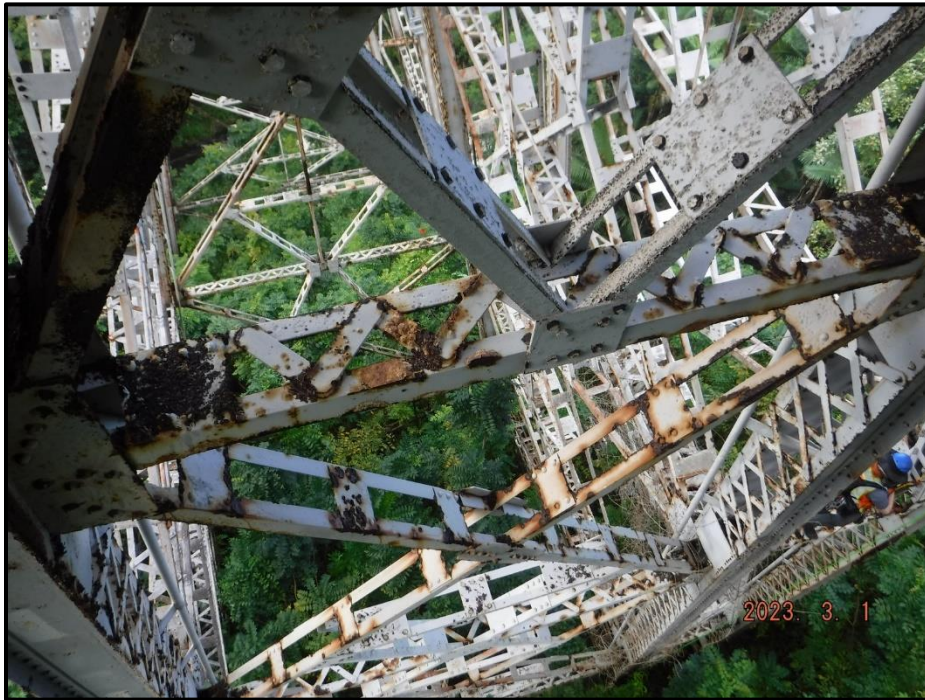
Bent 1, Level 1, Column D, east face, near mid height horizontal, looking west. Missing batten plate, CS3.
